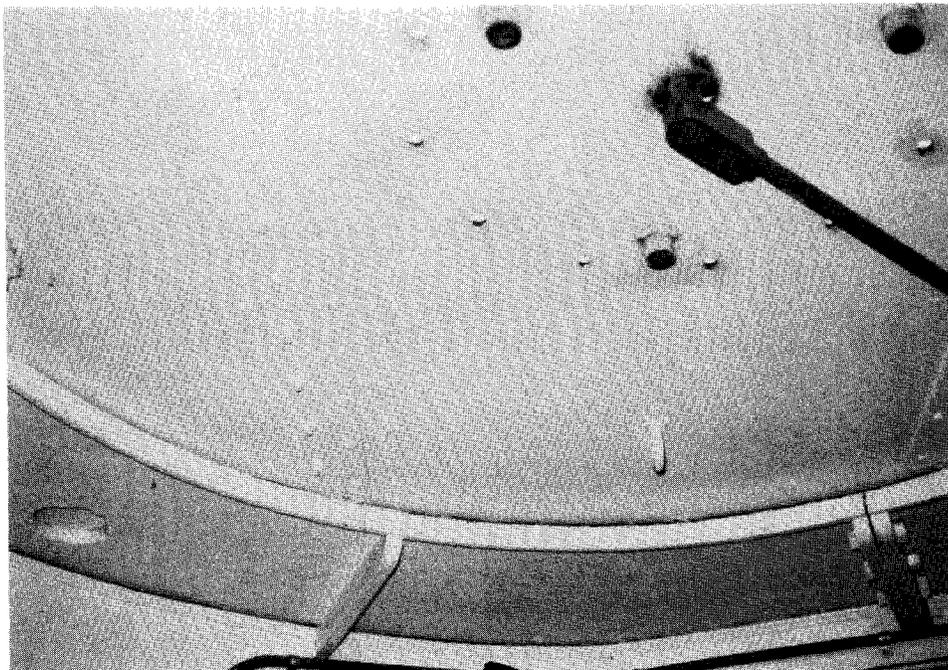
Room 112, Watch Deck ceiling (underside of Lantern Deck), showing original floor and later circular floor added to support 1946 beacon.
